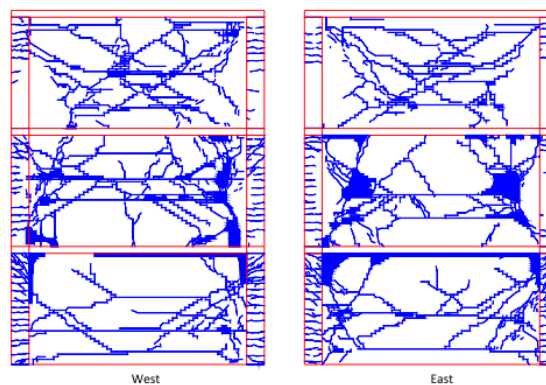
Crack maps from loading test of three-story masonry infill structure (Pujol and Fick 2010)
